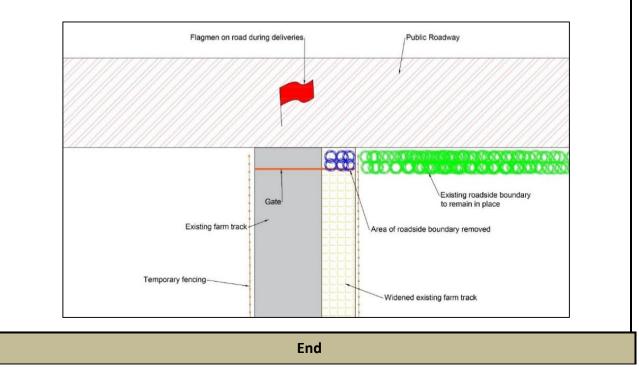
Plan View of Typical Temporary Site Entrance
